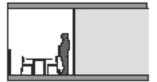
Every apartment is to have at least one balcony directly accessible from the main living area, with a minimum dimension of 2.5m
